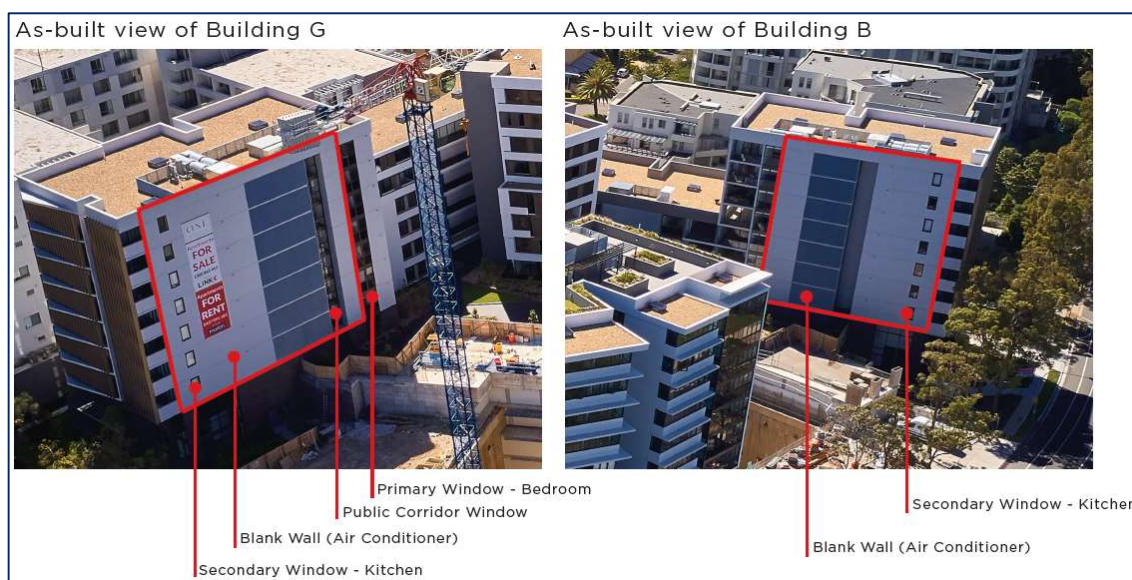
| As built views of side elevations of Buildings G and B (Source: FRtS Urban Design Report)
